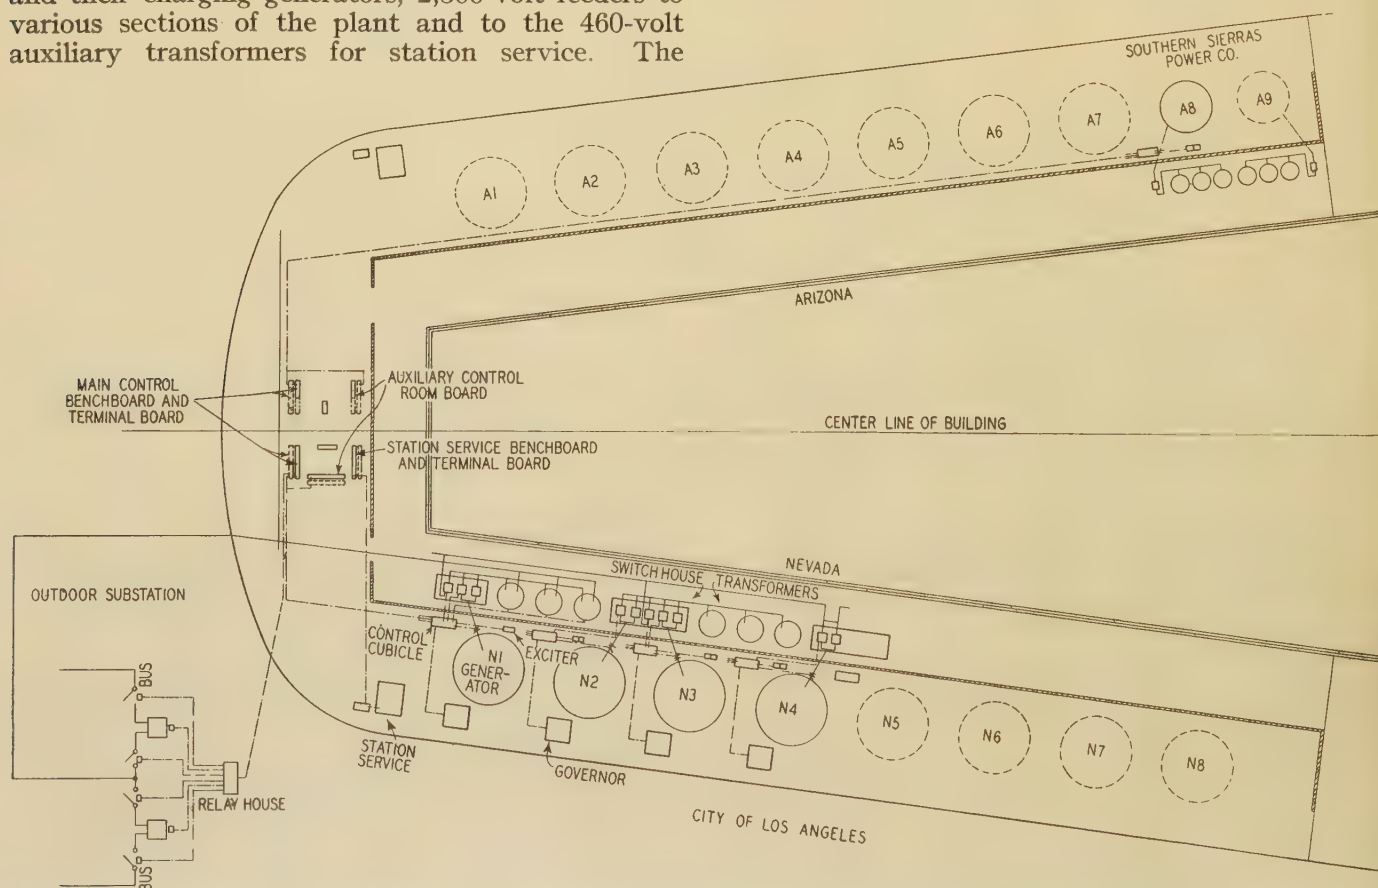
Schematic plan of the station, showing interconnections from control desk to the cubicles and outdoor substation
